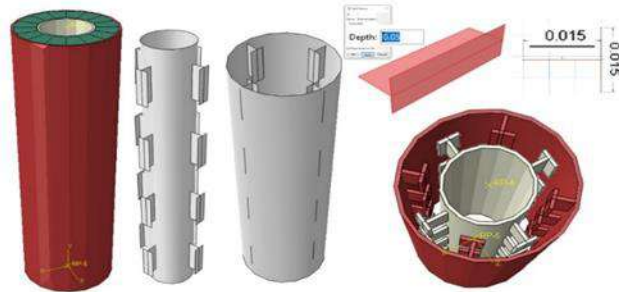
Example of a double shell steel column filled with concrete with a T-shaped stiffener, section at 4 parts of the column height (example "T8-4").
